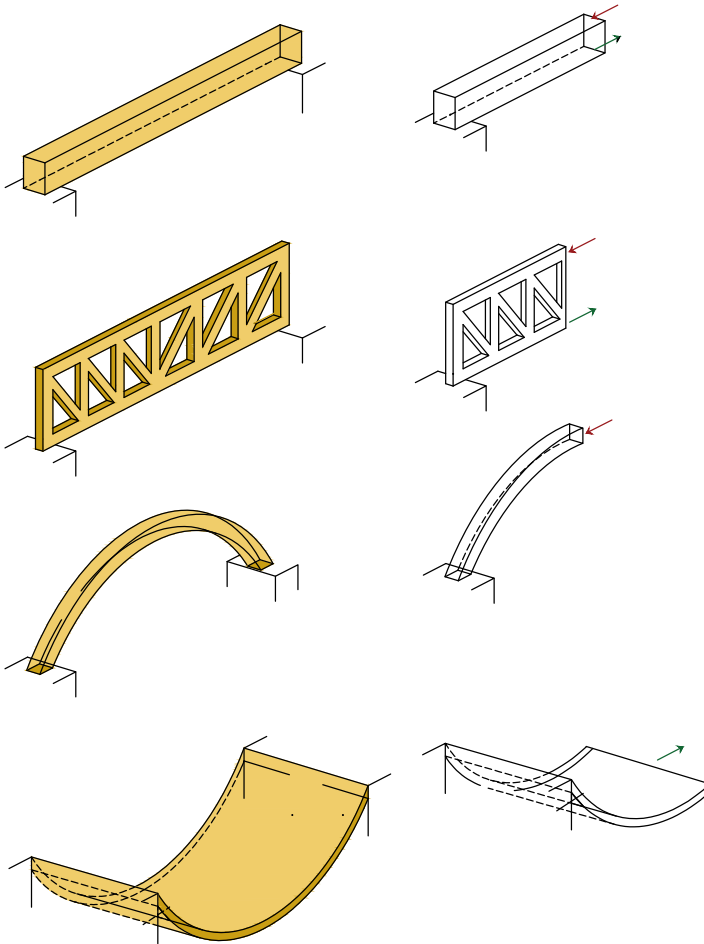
Different structural systems: a beam, a truss, an arch, and a tension structure
